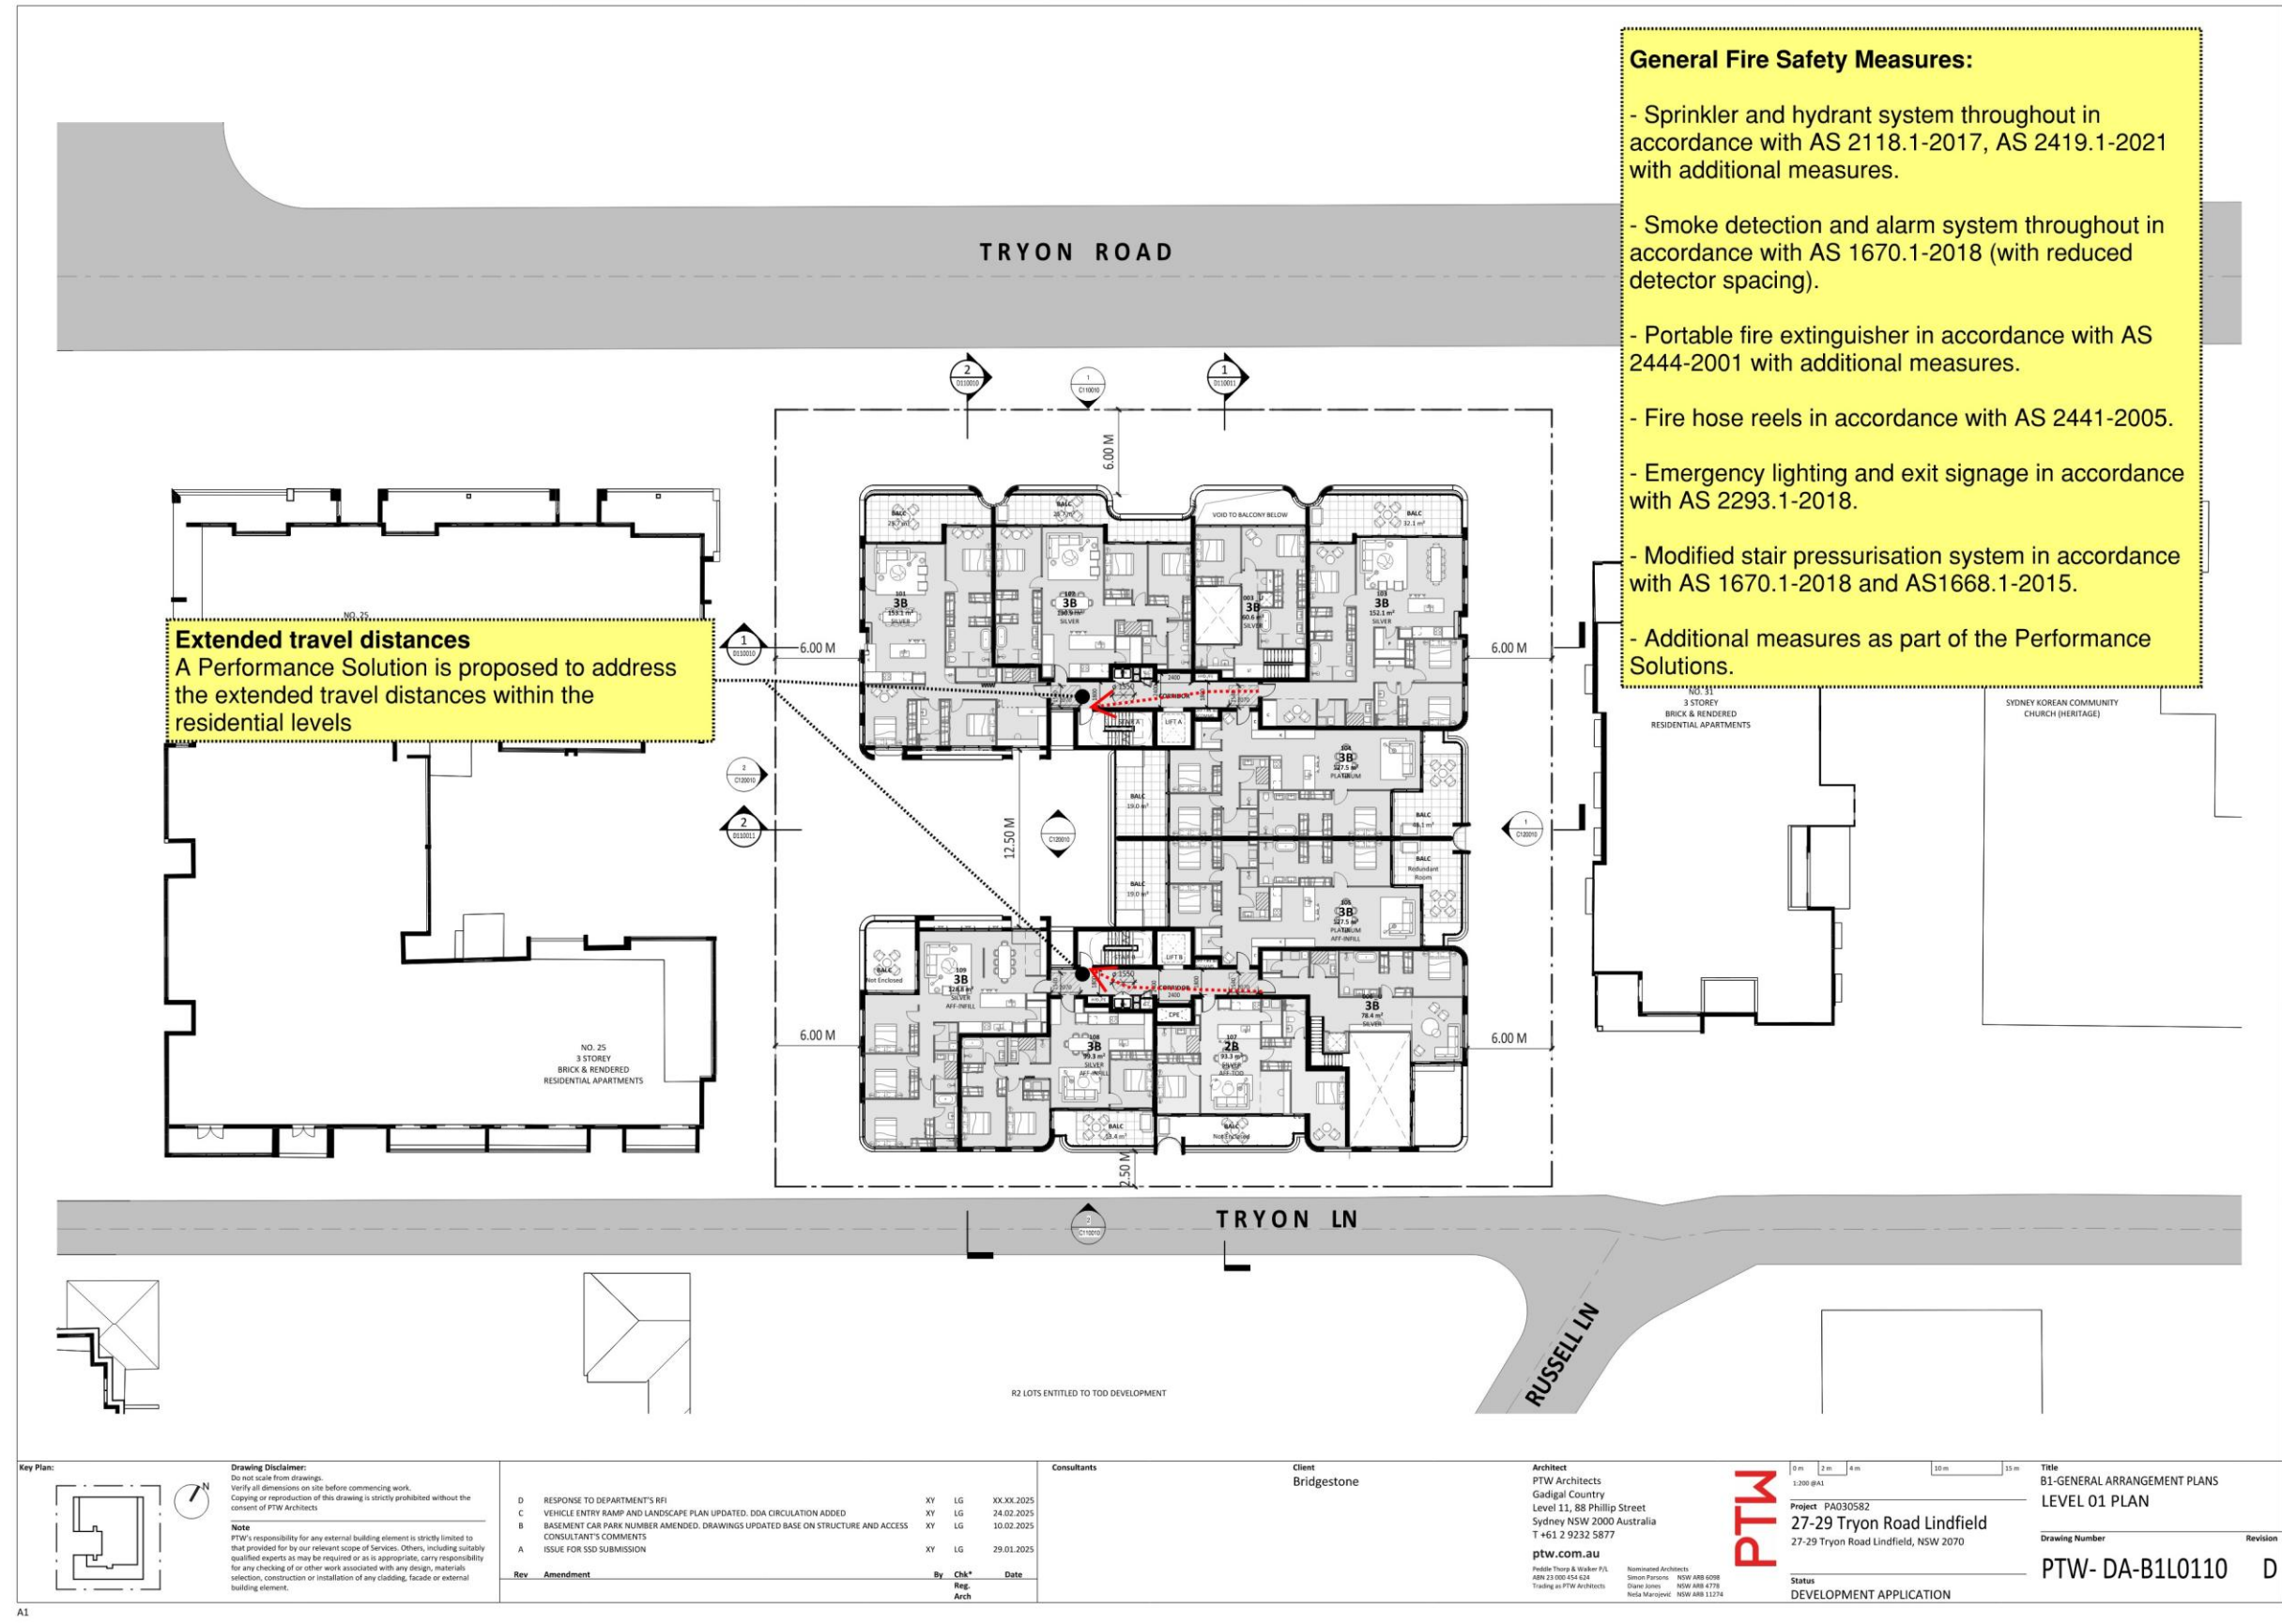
Proposed Fire Safety Strategy on Ground Floor
